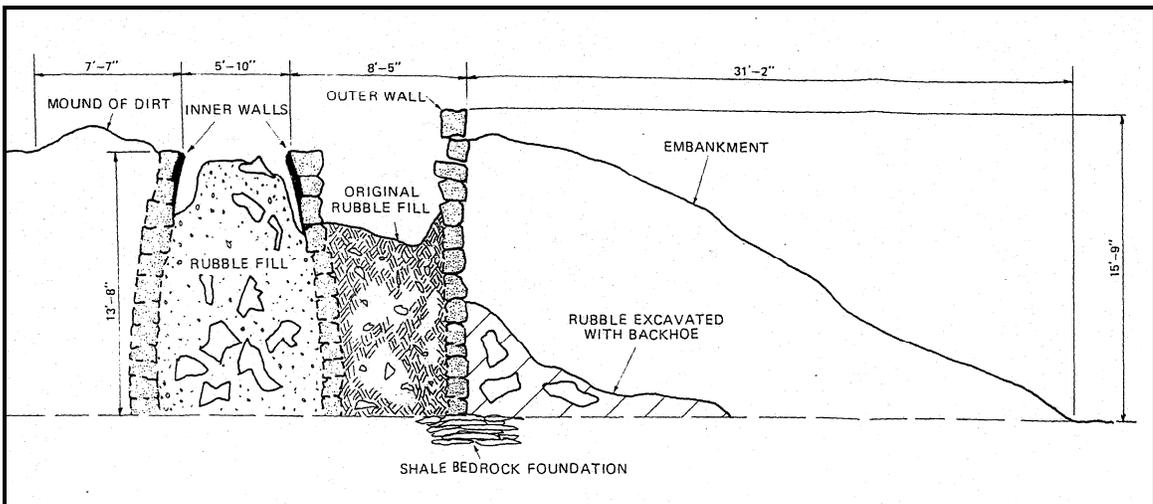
CA-BUT-392/H - Drawing (section view) of lime kiln. (Sampson and McAleer 1977)
